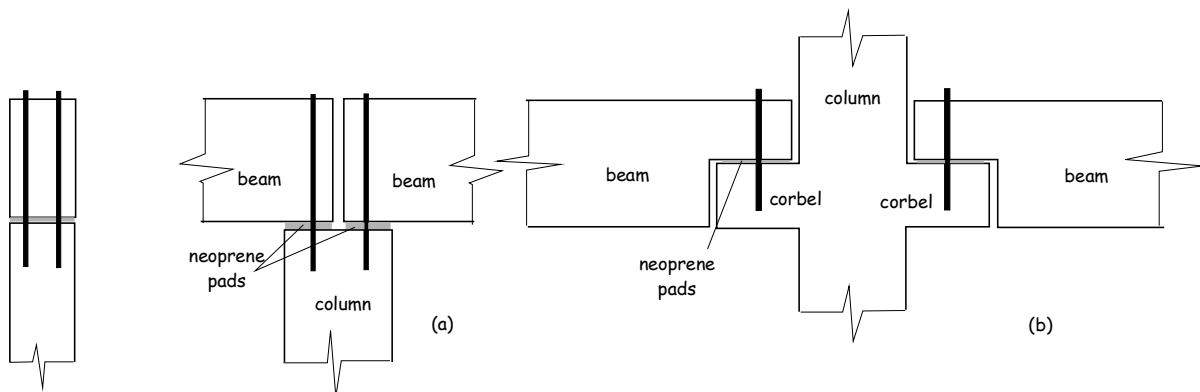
Beam-column connection for roofs (a) and for floors (b).
